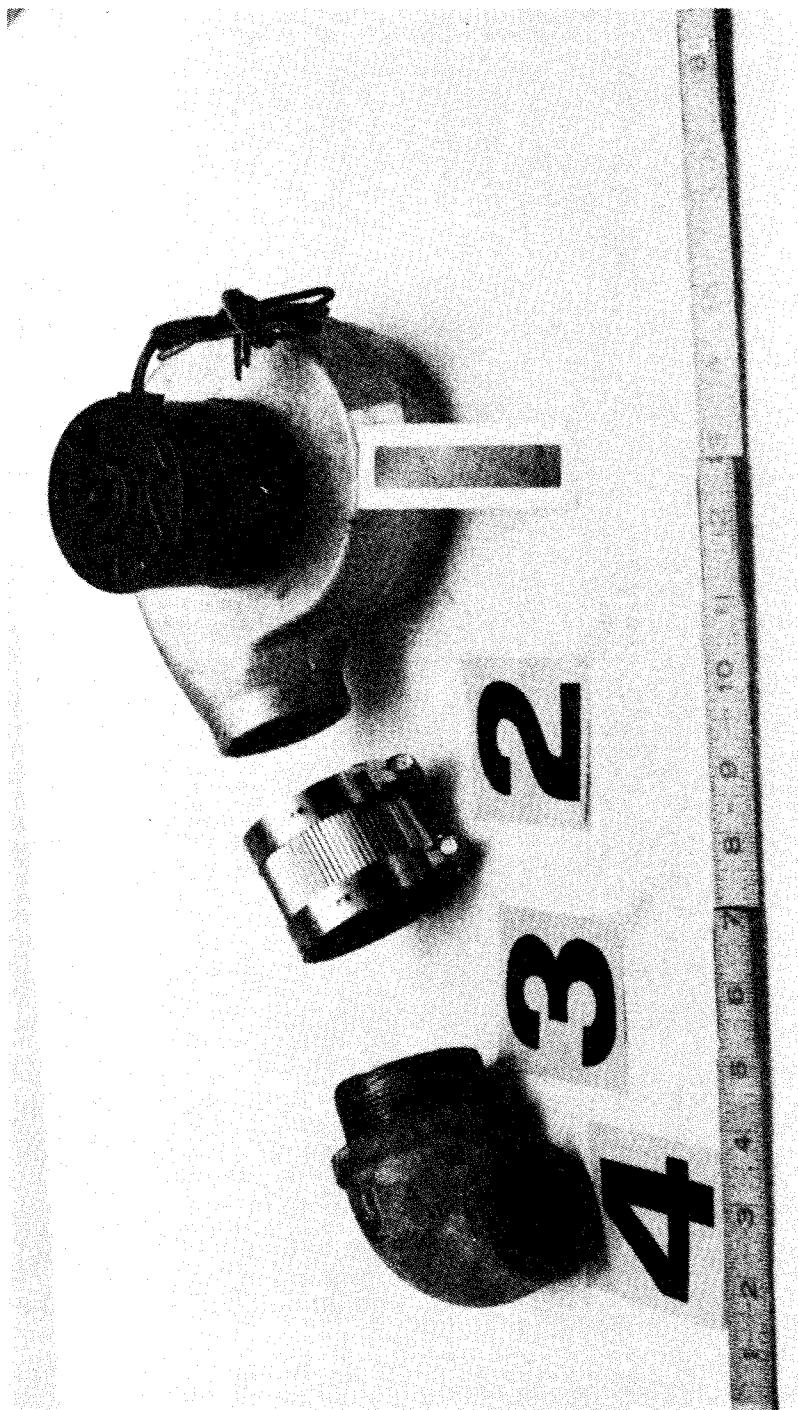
Blower (#1) with exhaust extension assembly. Note adapter coupling (#2), pipe nipple (#3), and elbow (#4) for vertical exhaust pipe.
